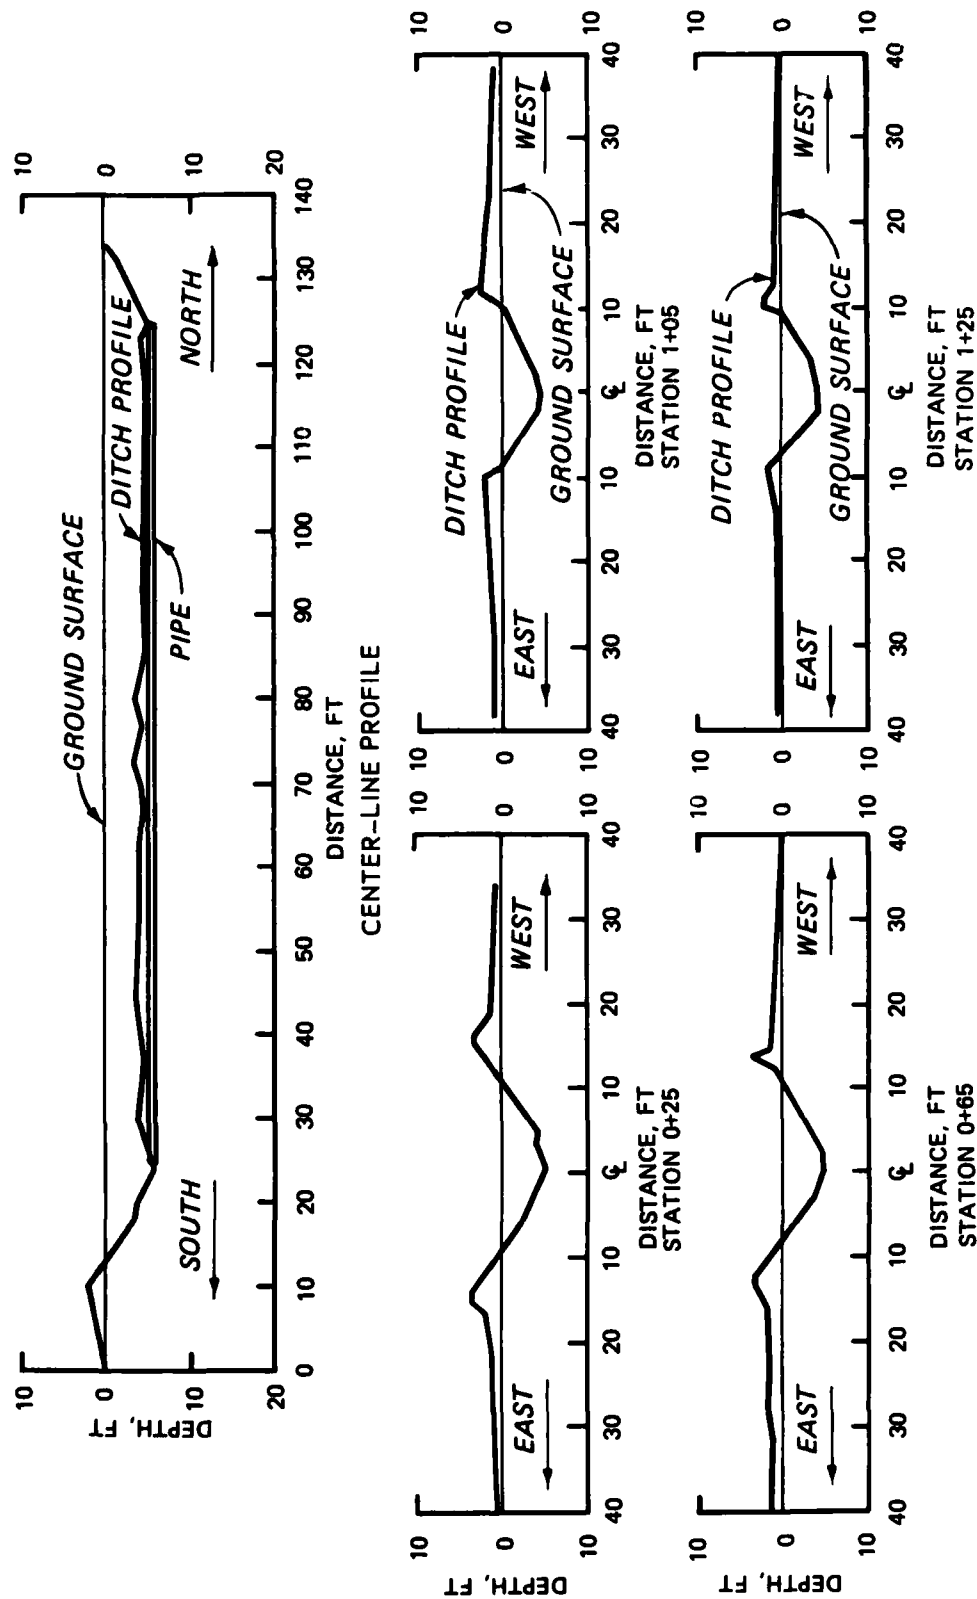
Shot 6SR1A (100-ft pipe shot), longitudinal and transverse profiles
